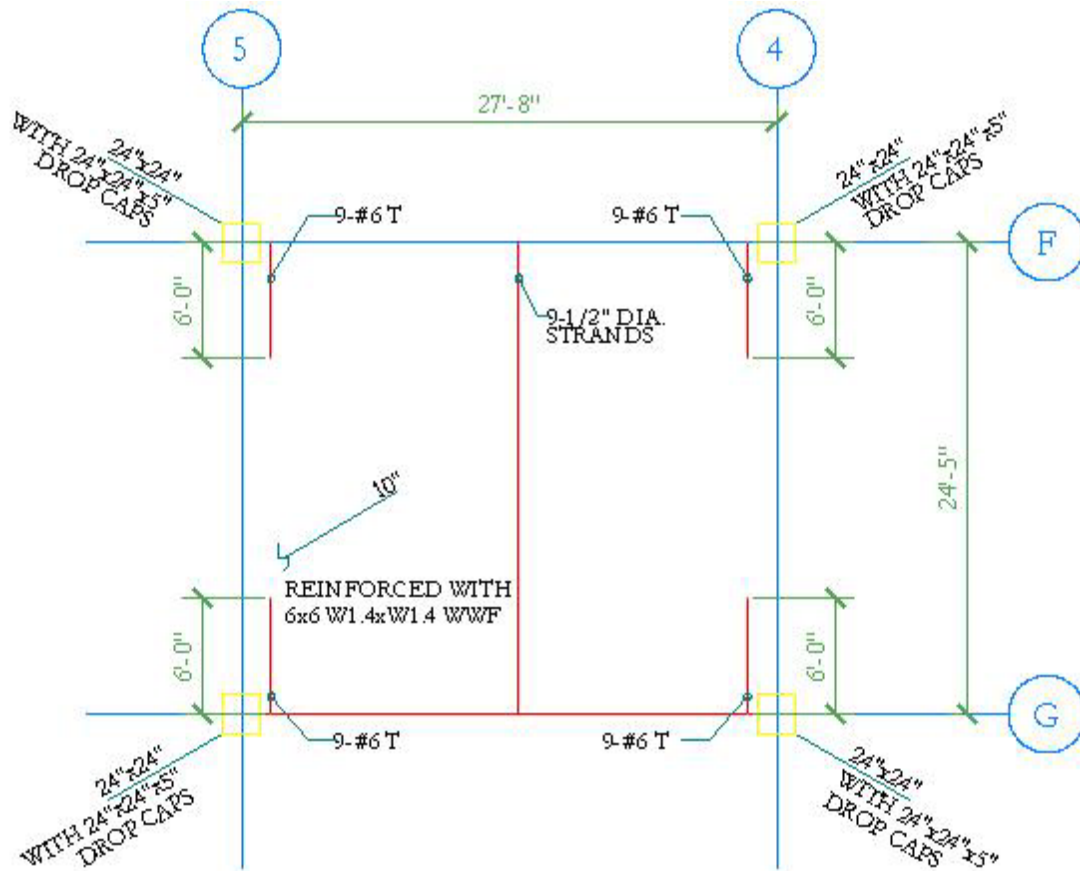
Two-way Post-Tensioned Concrete Typical Floor Framing Bay
